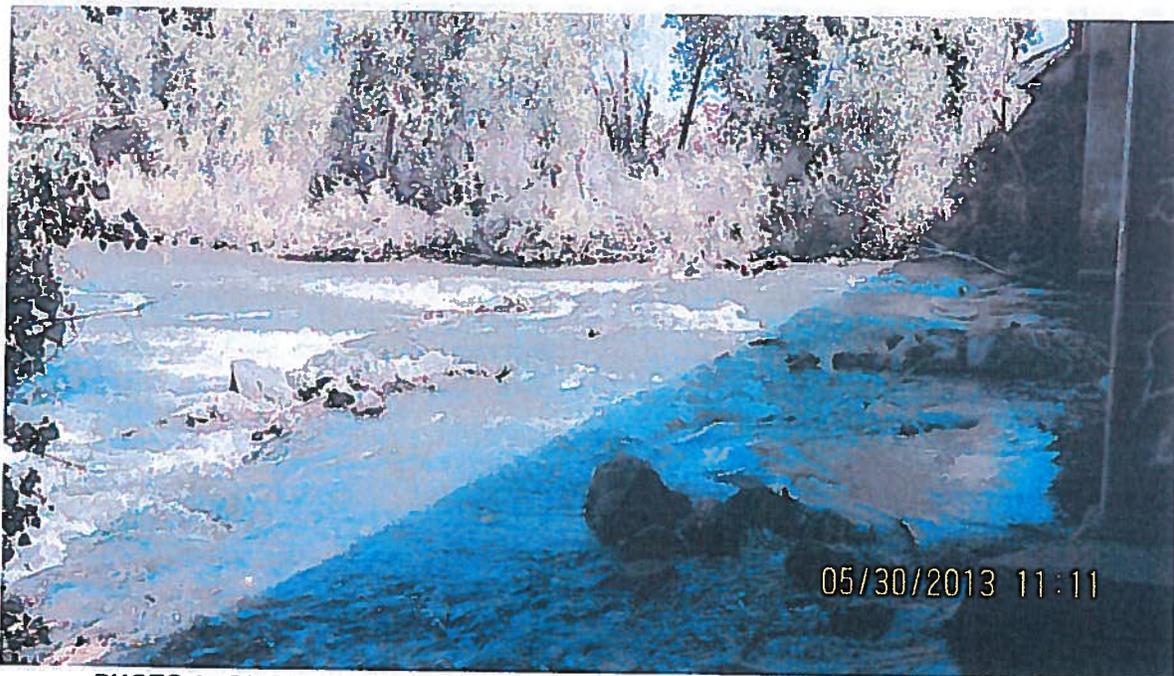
RIPRAP WEIR AT DOWNSTREAM FACE OF BRIDGE, LOOKING NORTH
